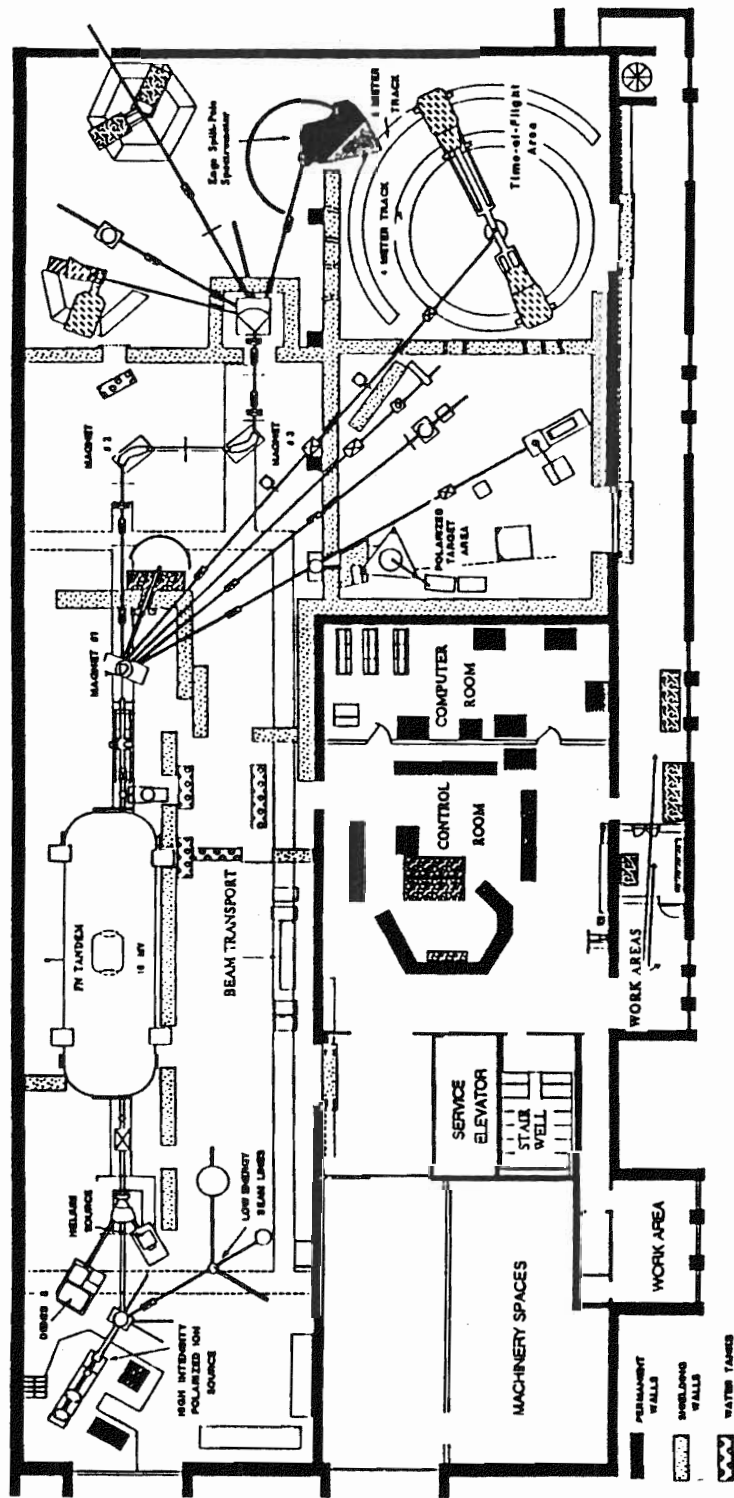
Floor plan of the accelerator facility at TUNL.
